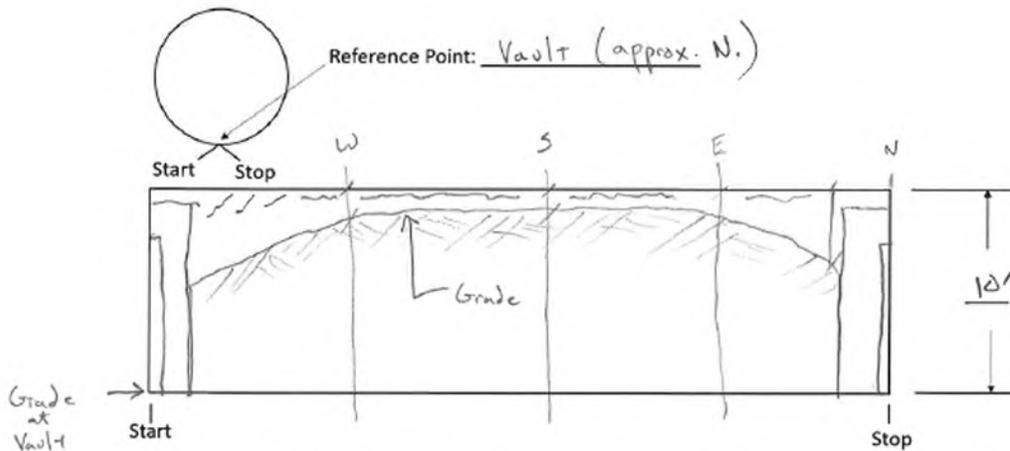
Reservoir EXTERIOR WALL Elevation– Note location of ladders and other features.
